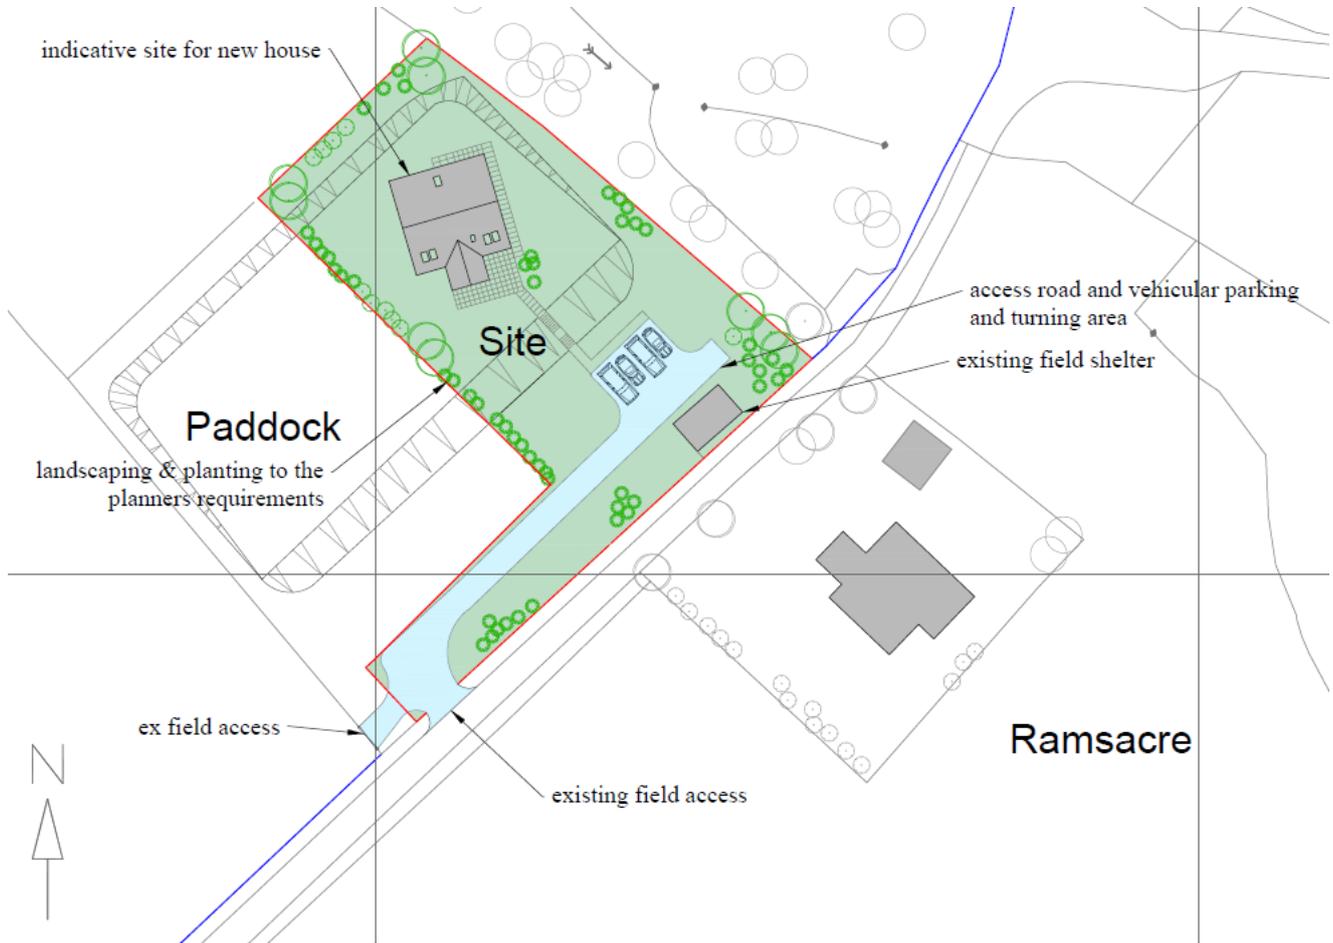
Extract from H096-SP01(A) Site Layout (Source: Aidan Hume Design)
